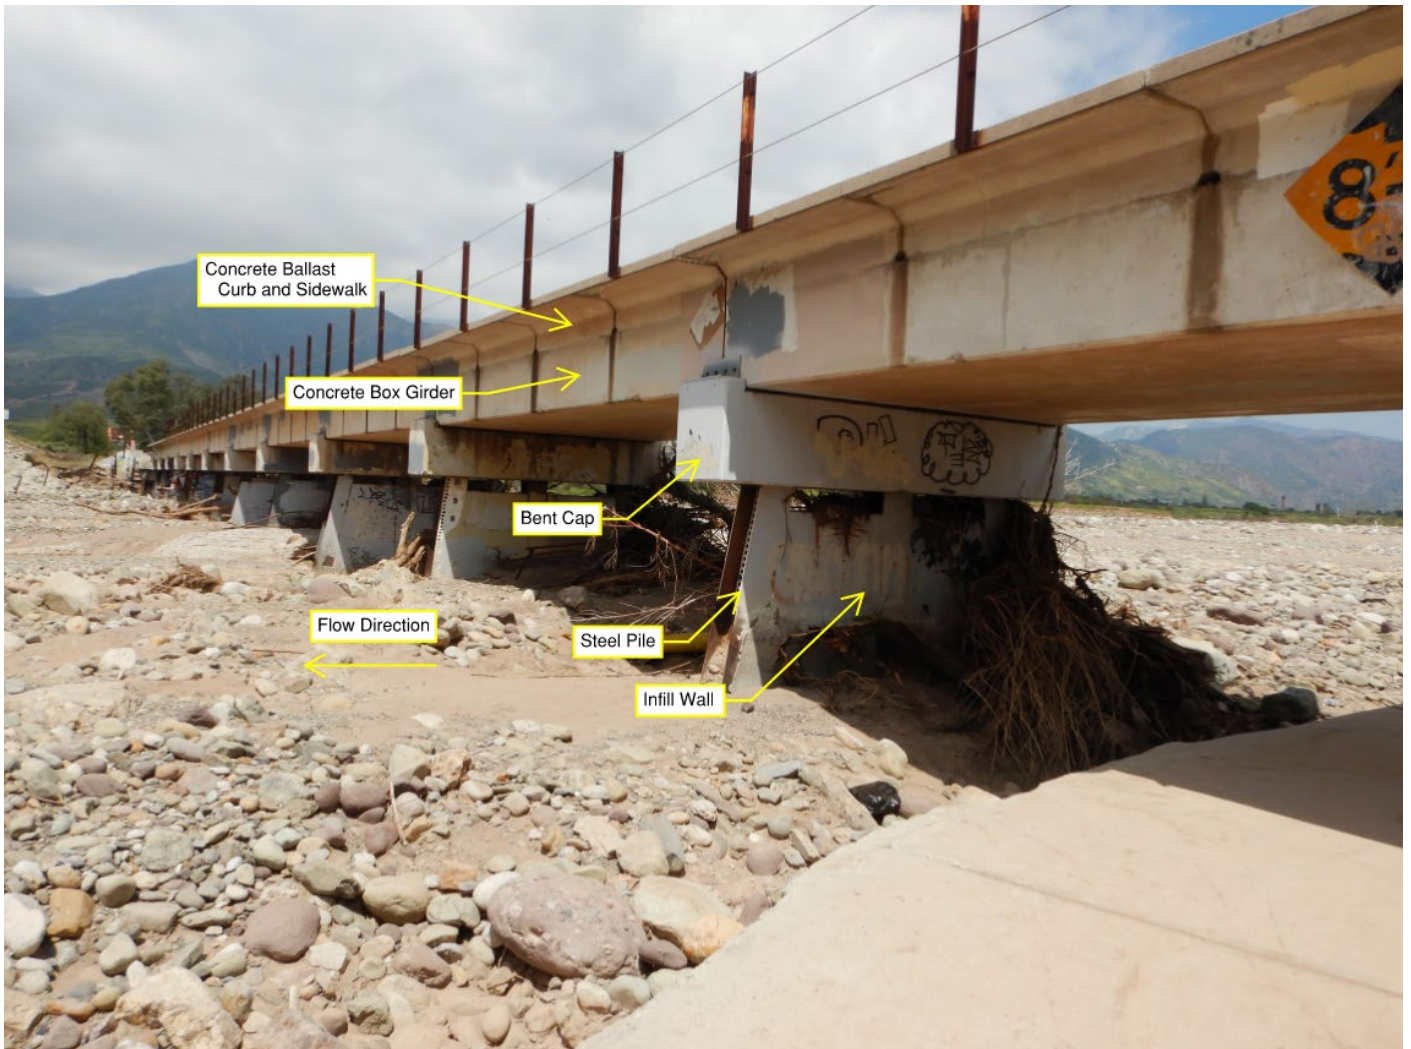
Downstream Side of Railroad bridge (East Side of Bridge)
